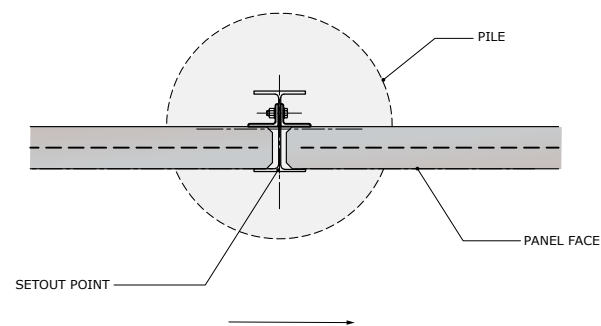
Typical fixing detail for the web-fixed panel arrangement (NTS)
